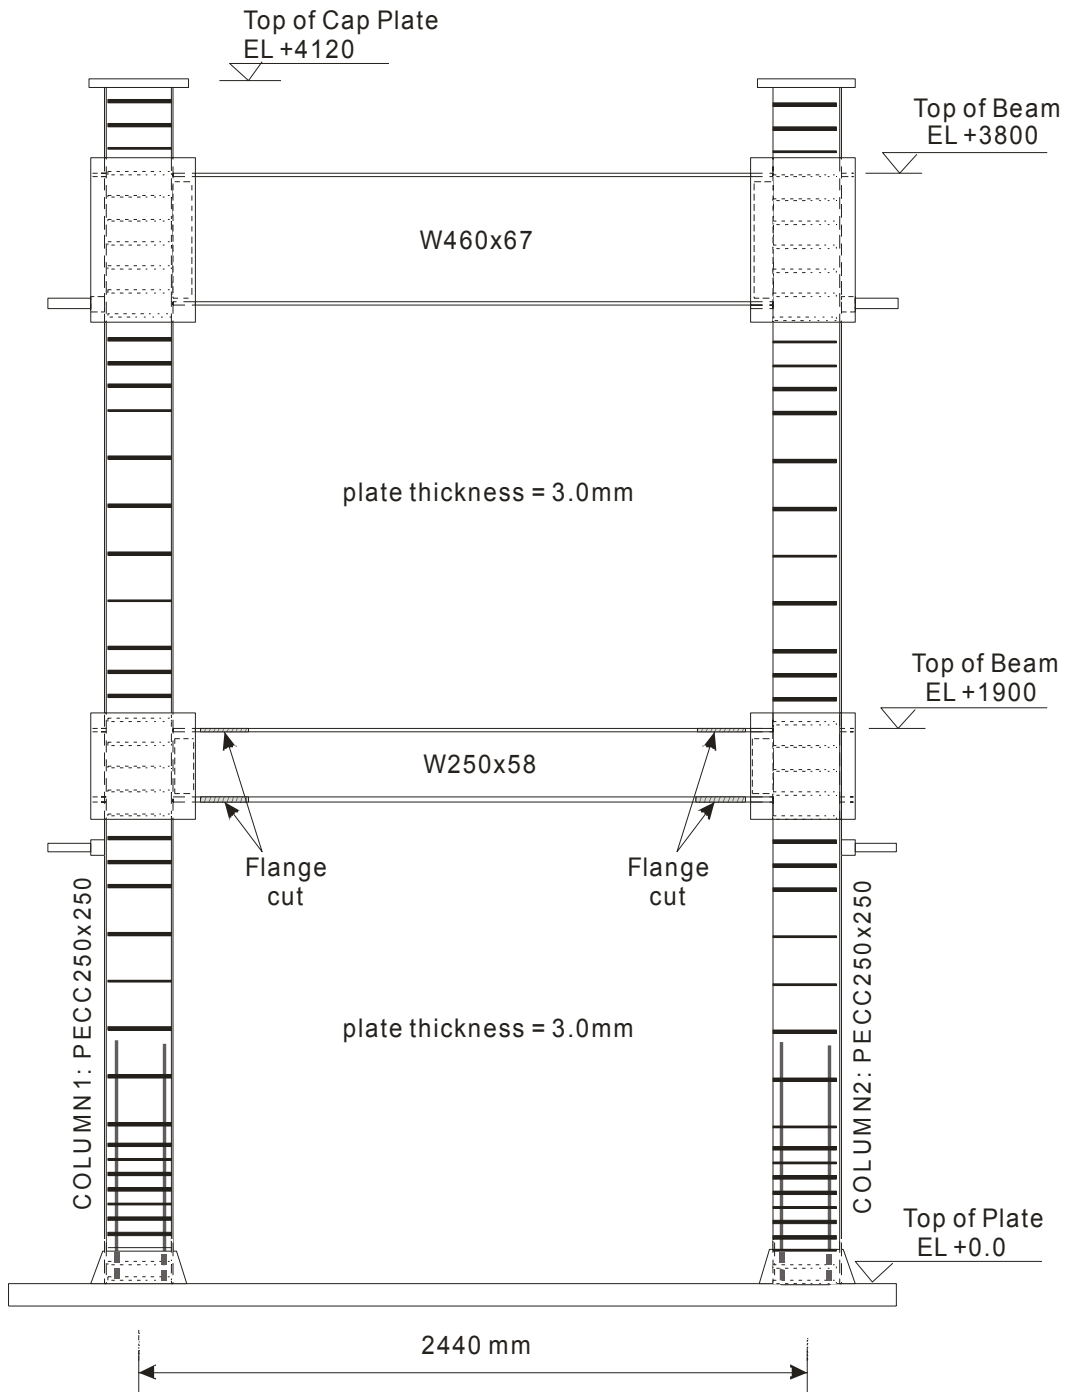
Steel plate shear wall test specimen with RBS connections in the first story
